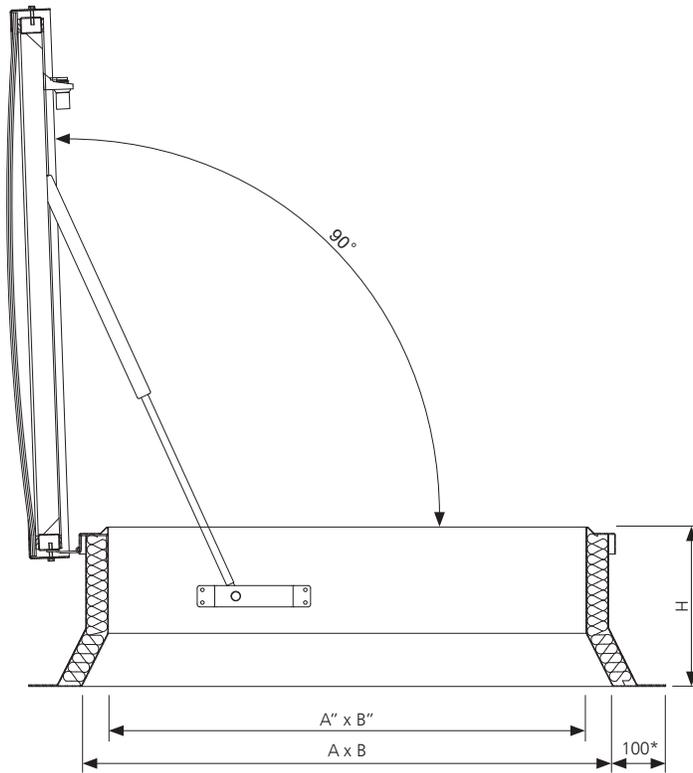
Section B-B of mcr PROLIGHT NG-A roof hatch in open position, dimensions in mm
